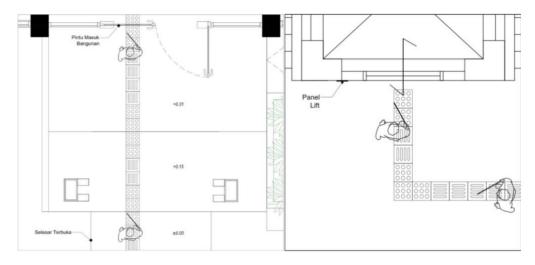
Tactile pavings on the stairs and building Figure 18: Tactile pavins on the building elevator entrances
